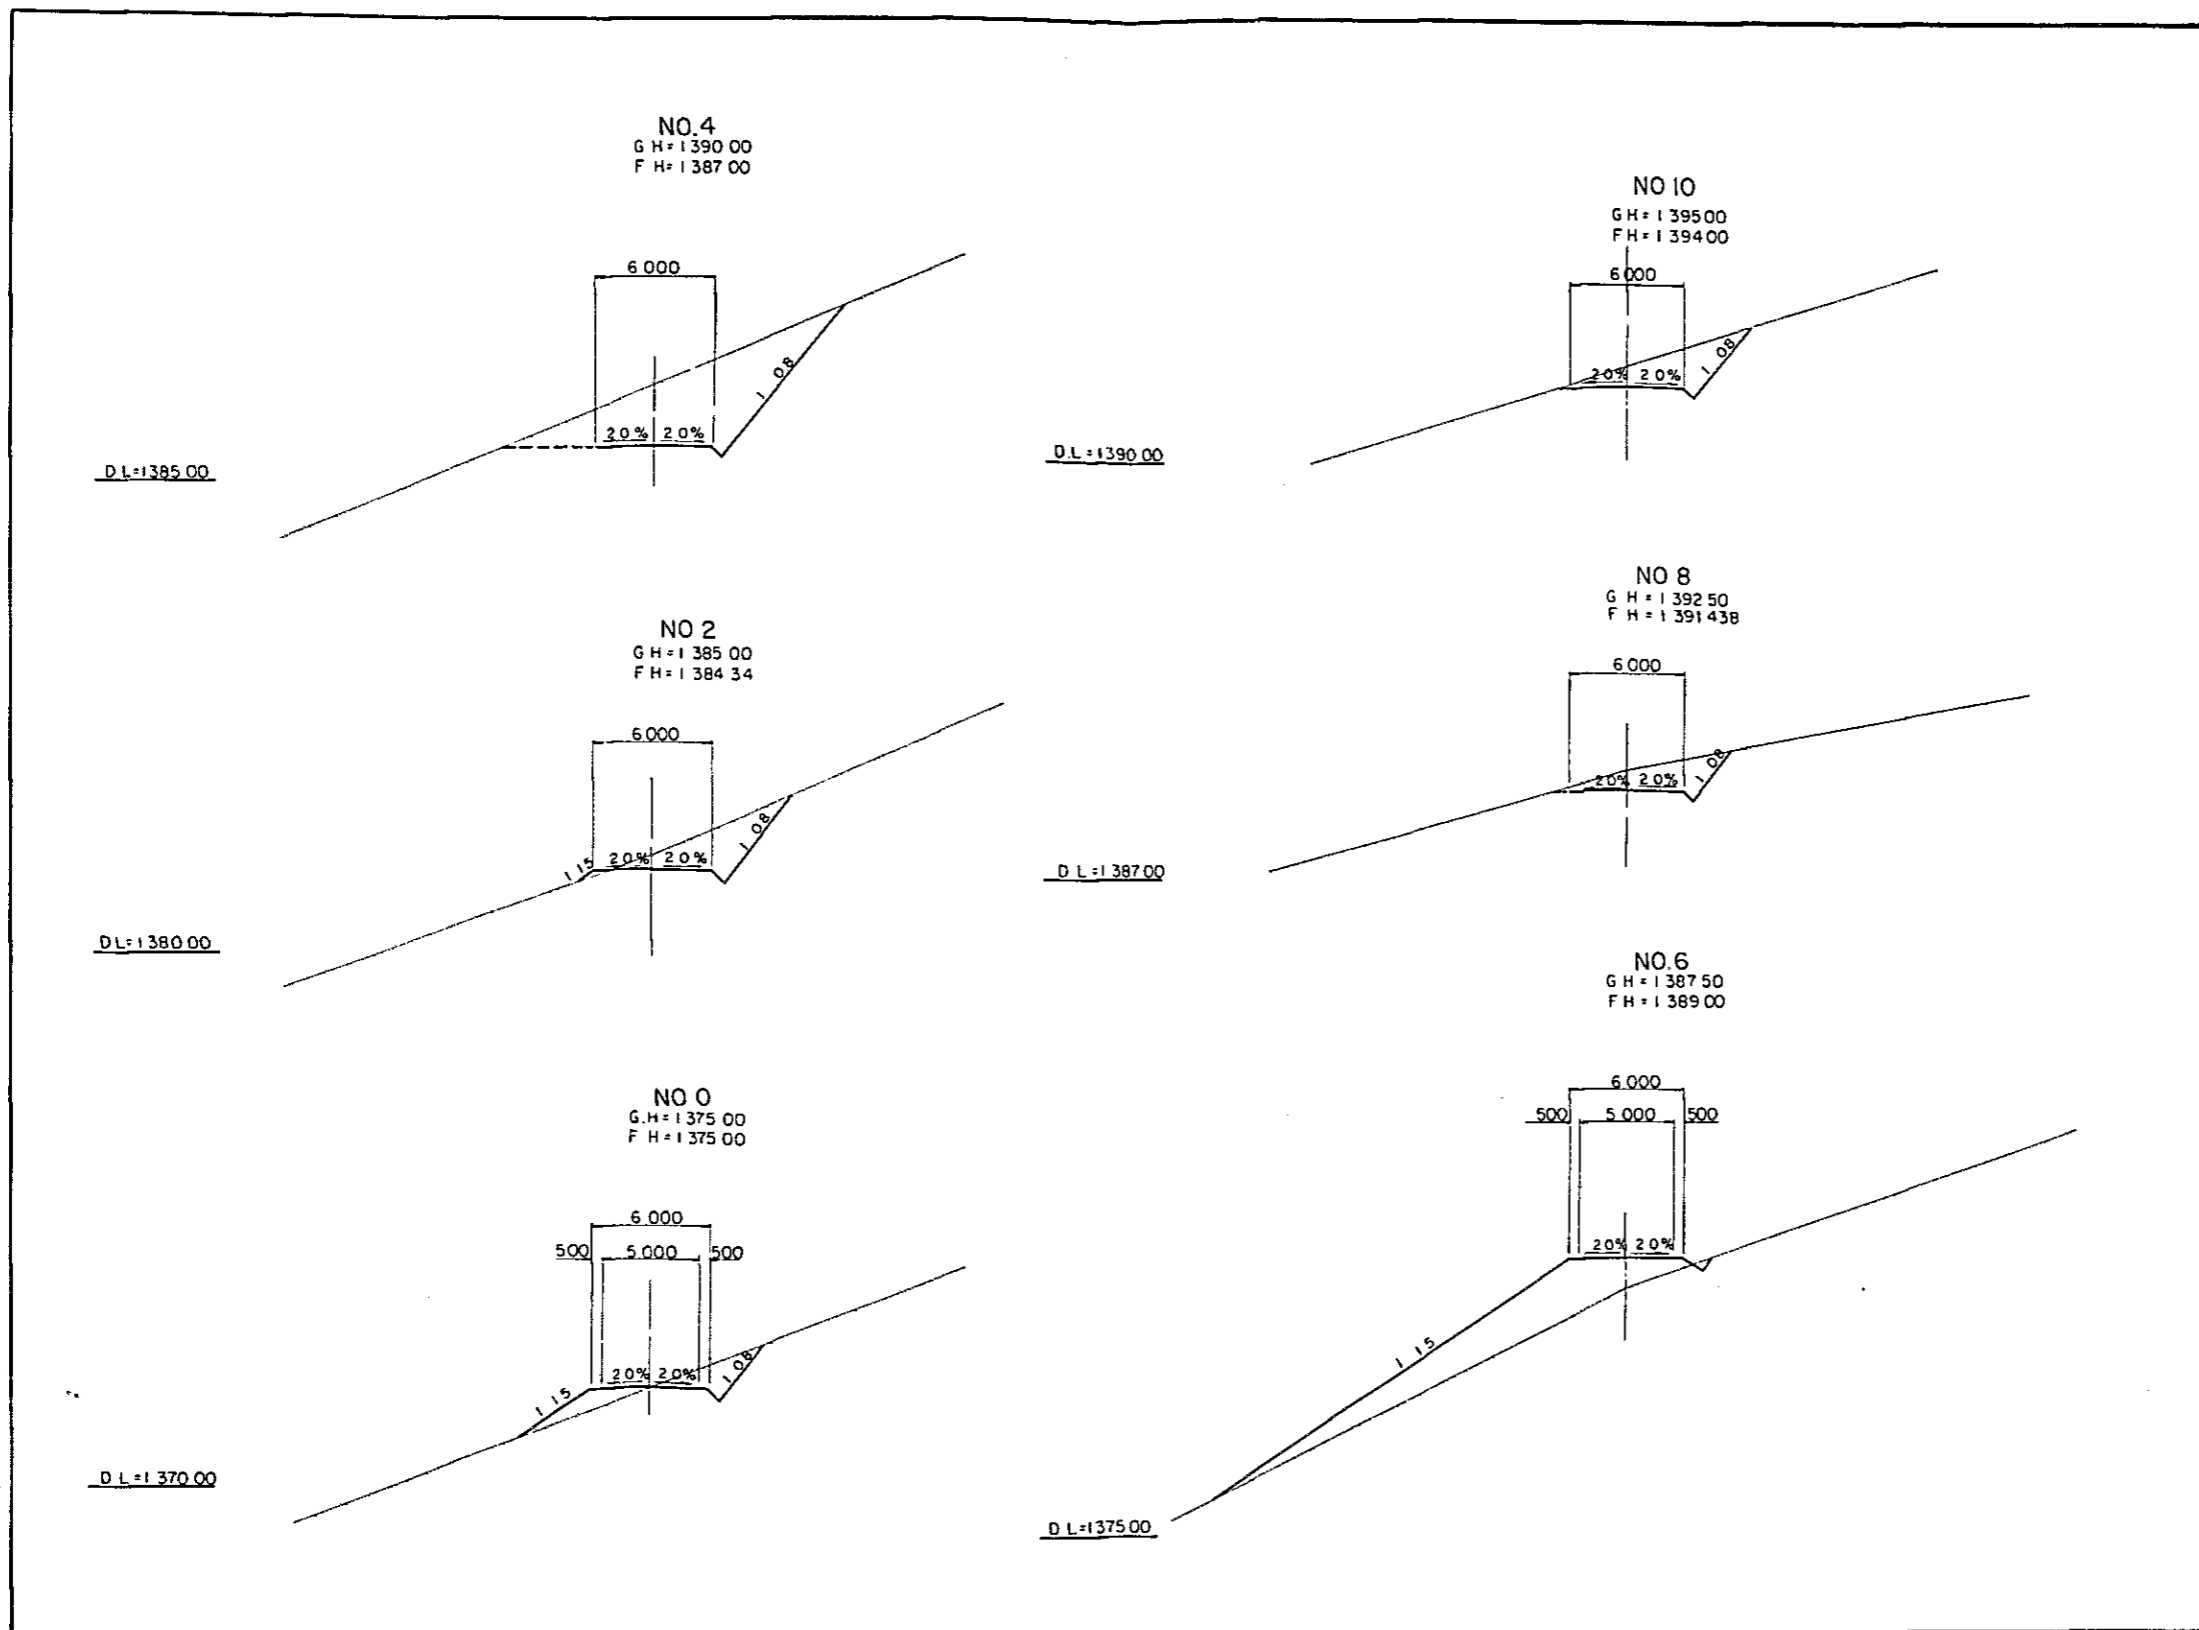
Cross Sections of the Proposed Access Road (1)
